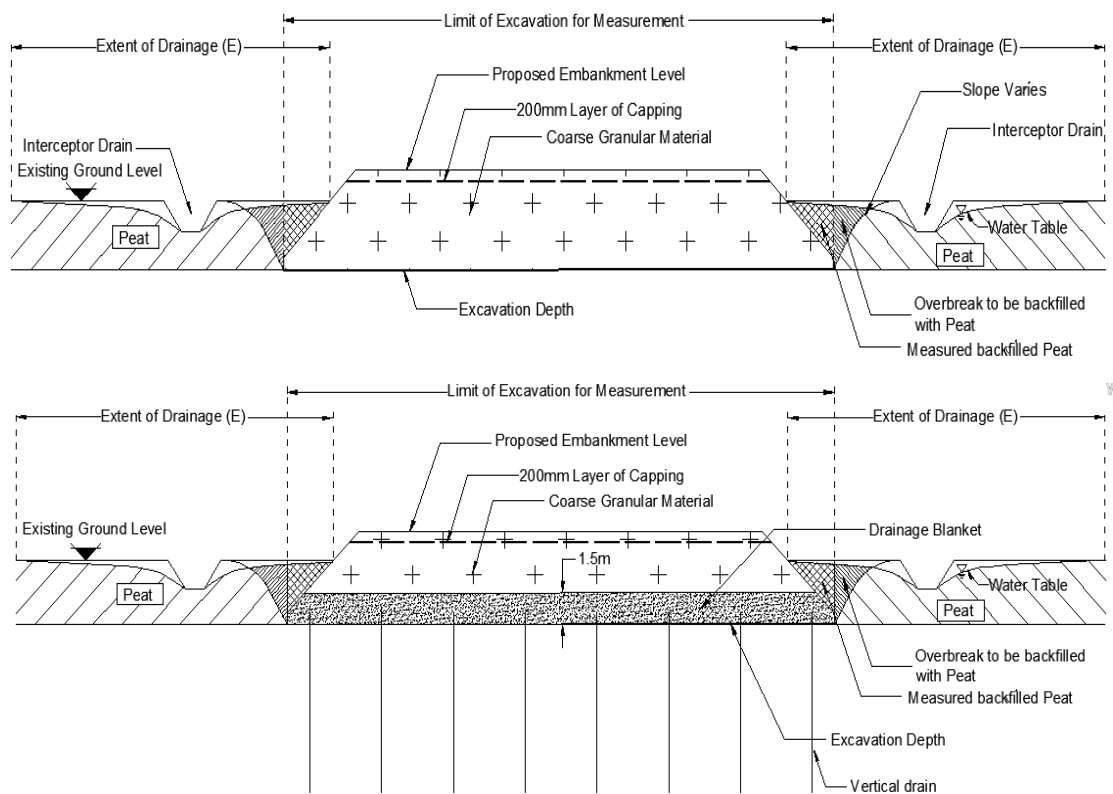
Typical cross sections of (a) rock embankment (top) and (b) rock embankment with vertical drains (bottom) (Courtesy of RPS Group)
